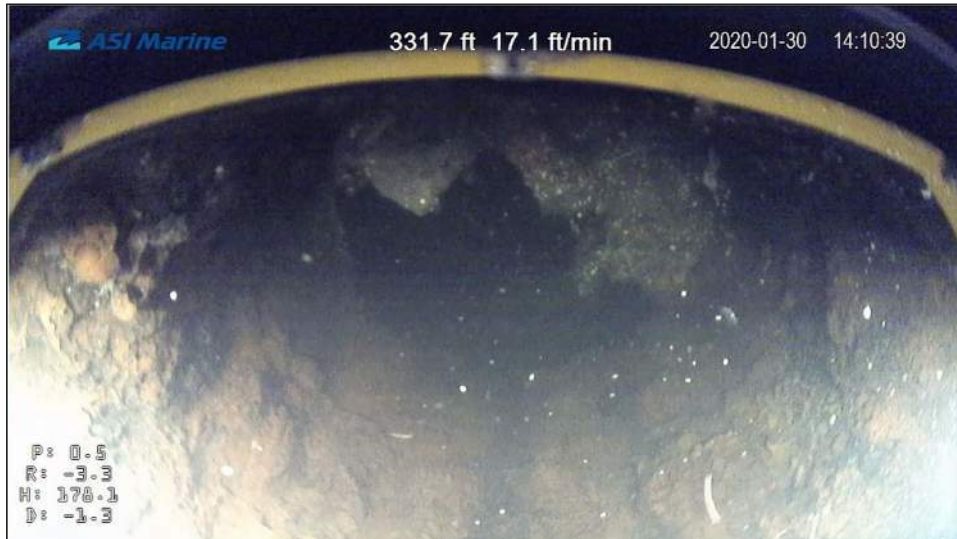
Opening in crown 332 feet downstream of Access Point 1.
